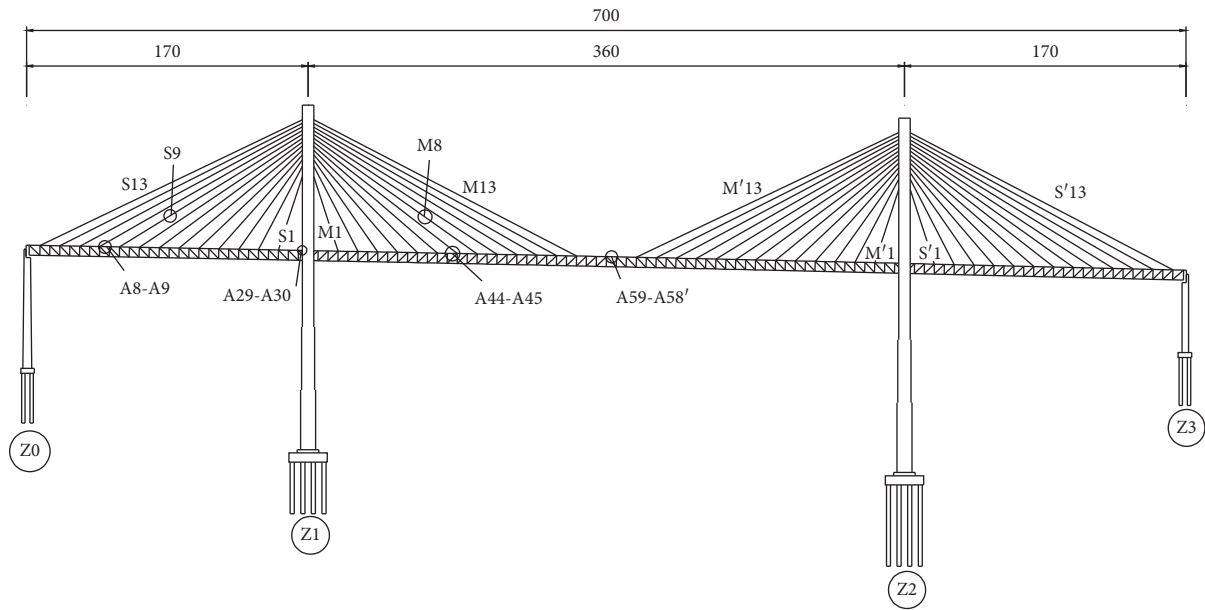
Failed members and corroded bridge sections (units: m).
